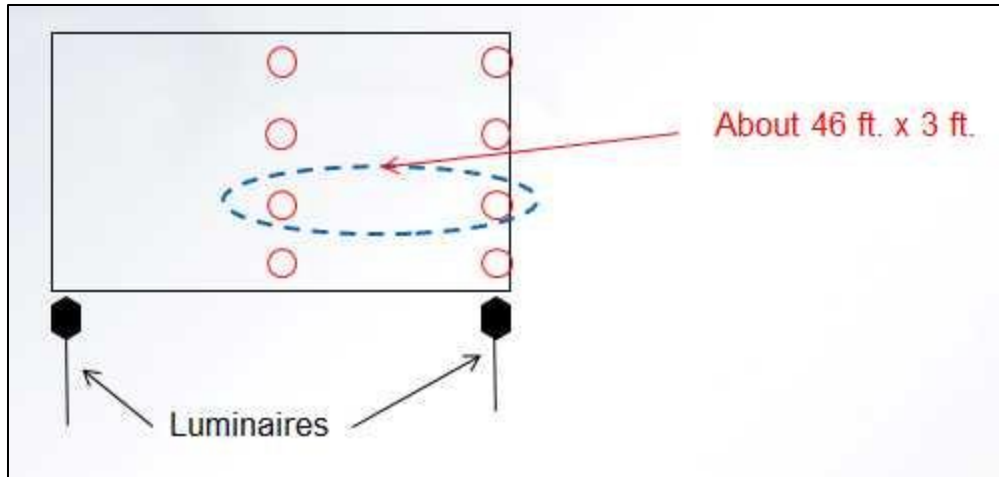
Luminaire Meter's View Area Overlapping Two Measurement Spots during Luminaire Measurements at the Concrete Walkway Test Site
